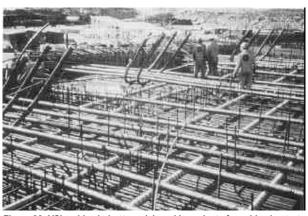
VSL cables in bottom slab and loop ducts for cables in struts
